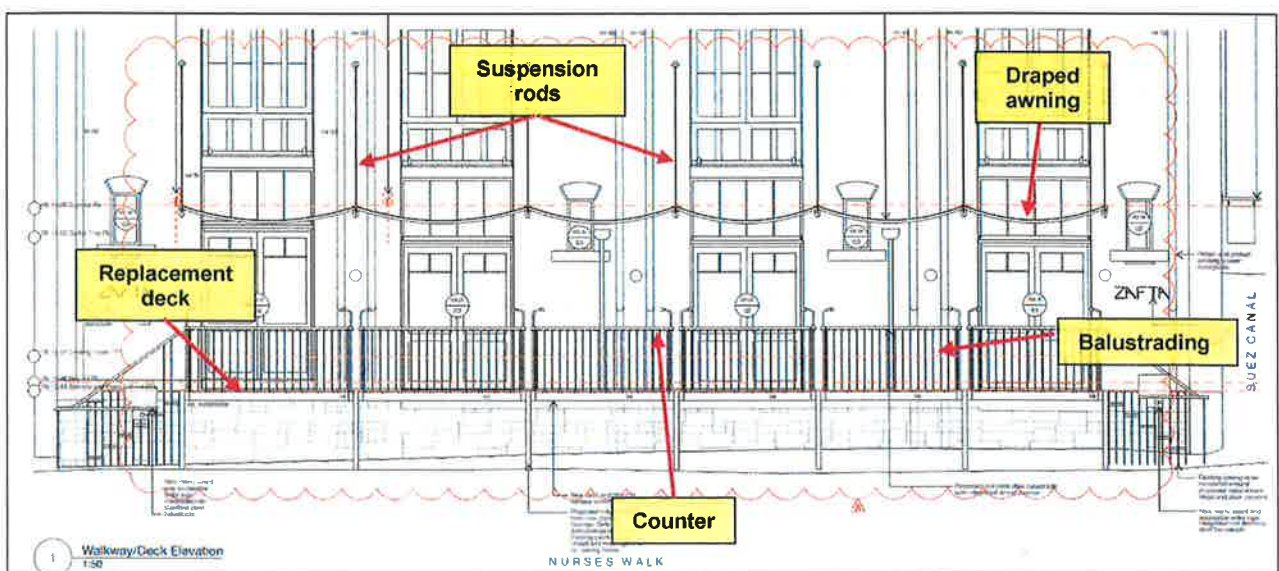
East elevation showing rear external work (Source: Applicant's RtS).
